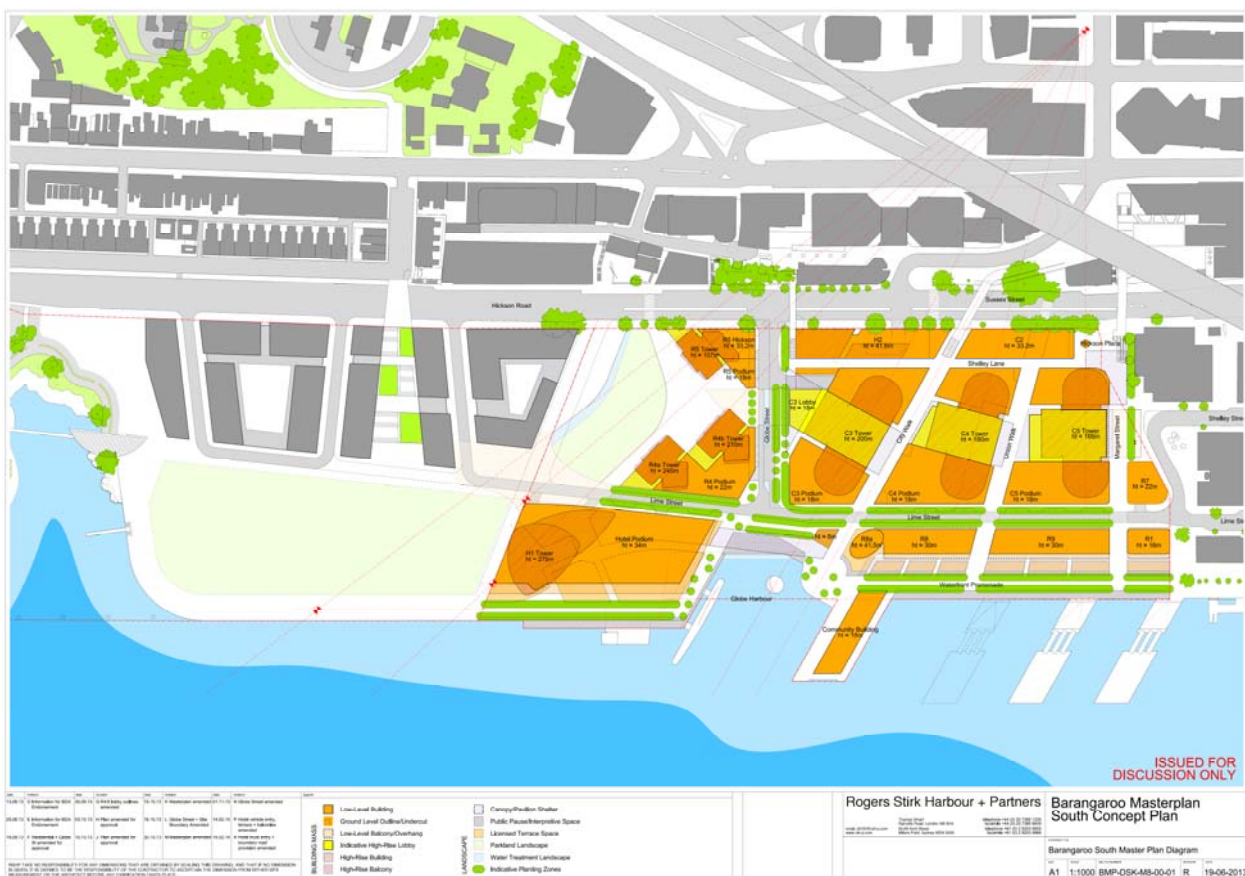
Barangaroo South Indicative Master Plan (Rogers Stirk Harbour + Partners, BMP-DSKM8-00-01/N)
